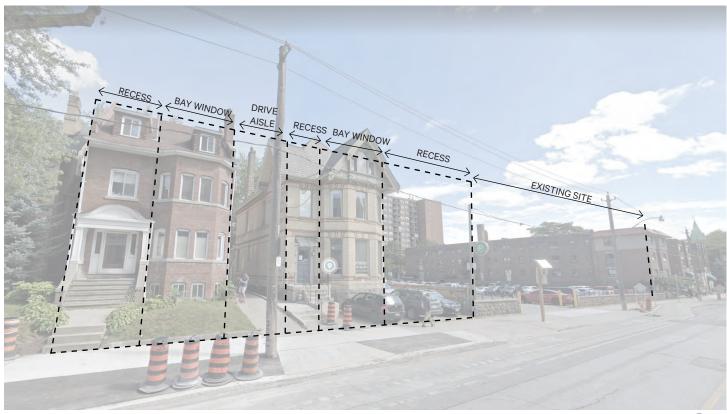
Sherbourne Street Elevation Horizontal Datum Lines
